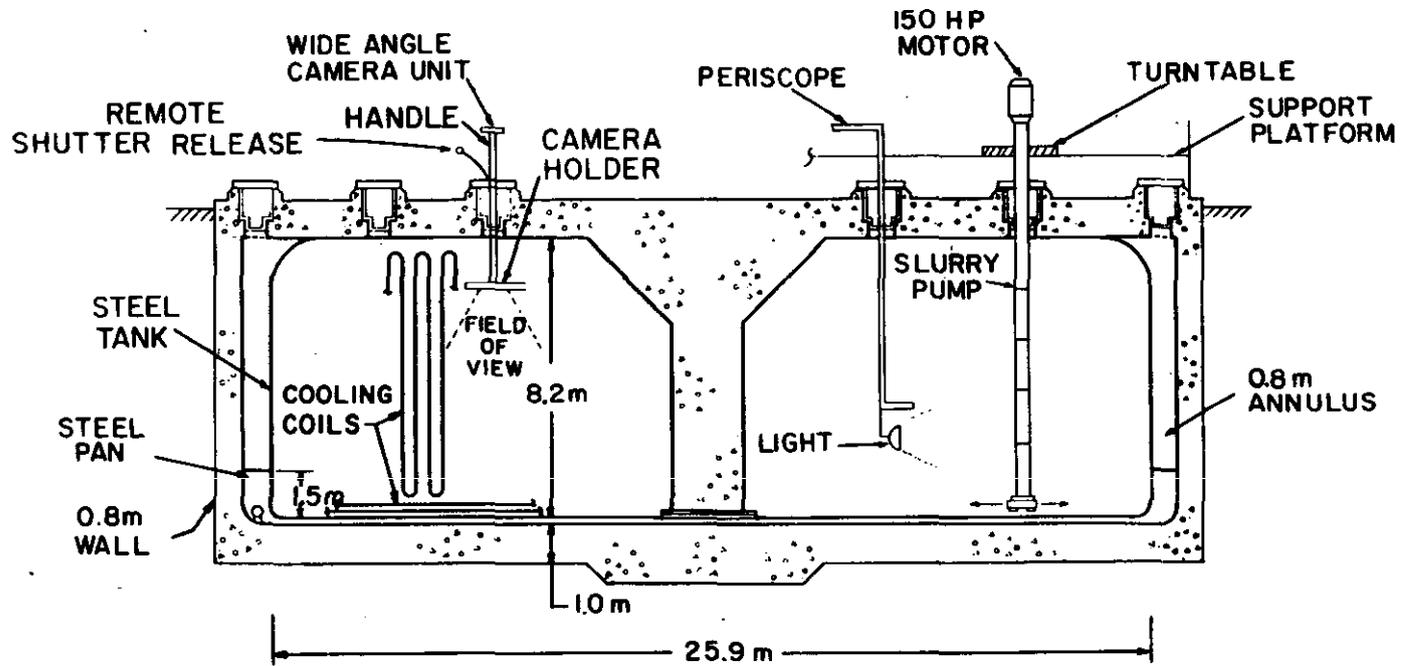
TANK DIMENSION AND EQUIPMENT LOCATIONS
